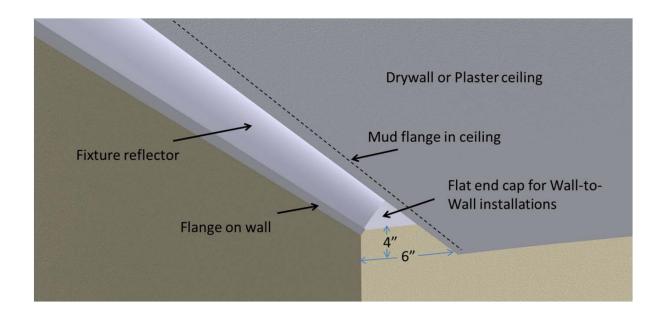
Detail A. PLASTER RAIL IS MUDDED INTO BACK WALL, FIXTURE'S MUD FLANGE IS MUDDED INTO DRYWALL OR PLASTER CEILING. FIXTURE IS SHOWN BUTTED AGAINST SIDE WALL.
